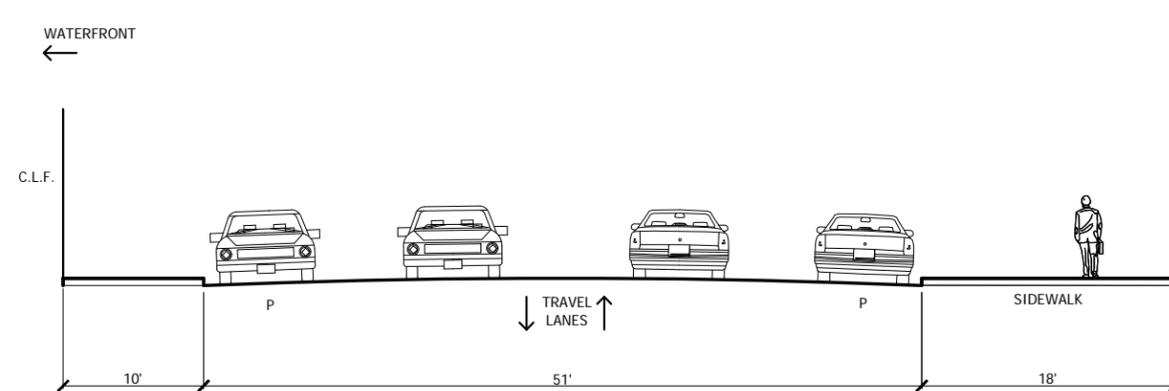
Existing configuration on Second Avenue 27th Street to 39th Street
